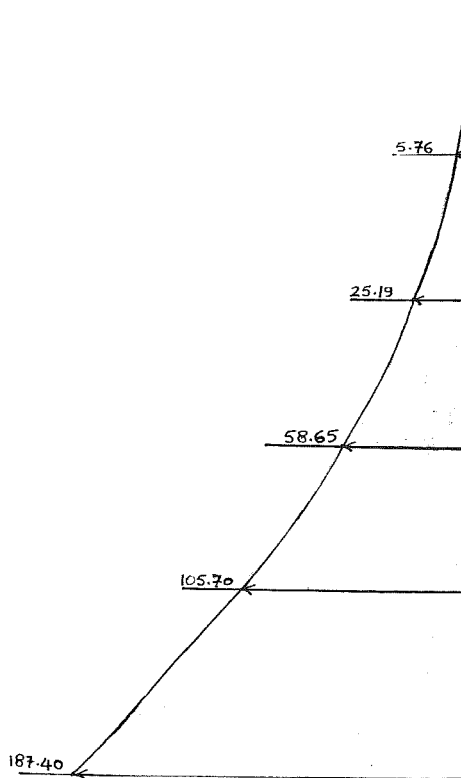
B.M.D. OF STRUCTURAL WALL.
